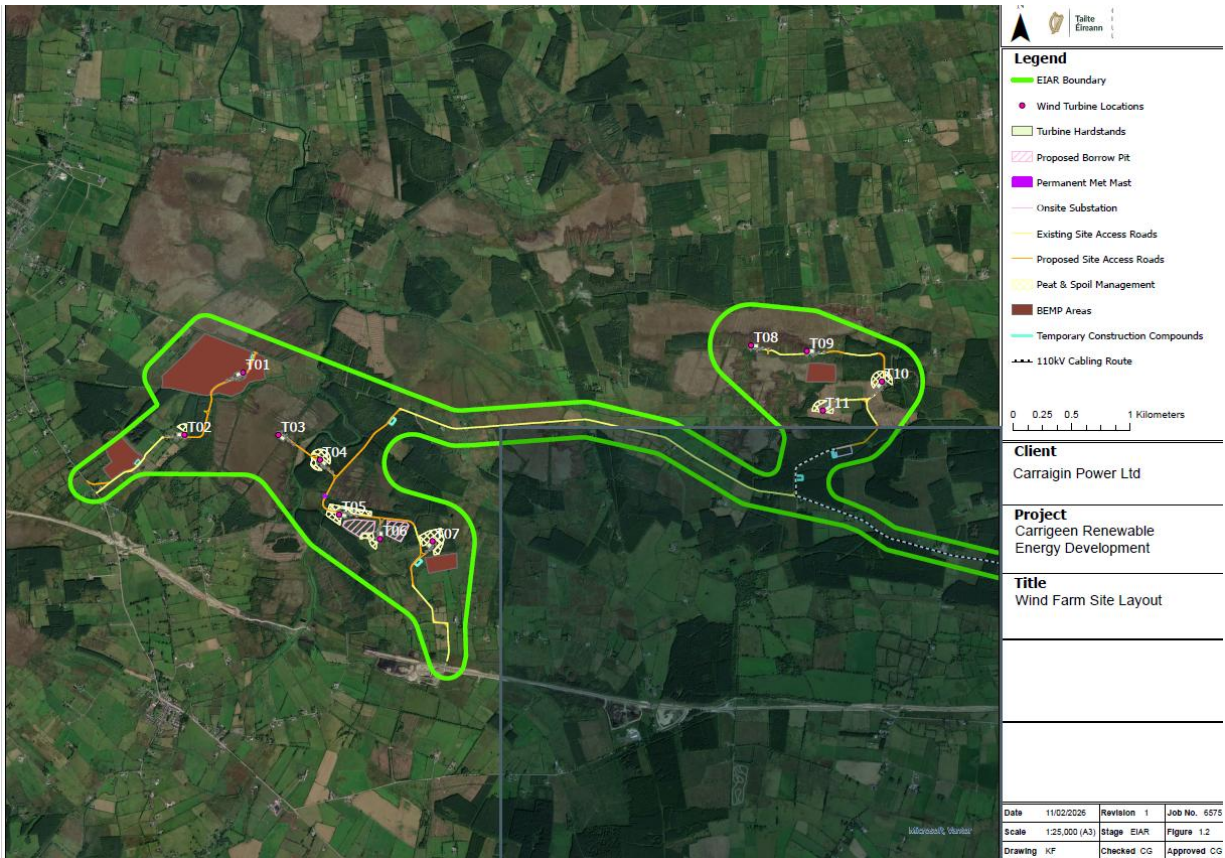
Proposed site layout – turbine area (Source: Volume III EIA/R Figures)
